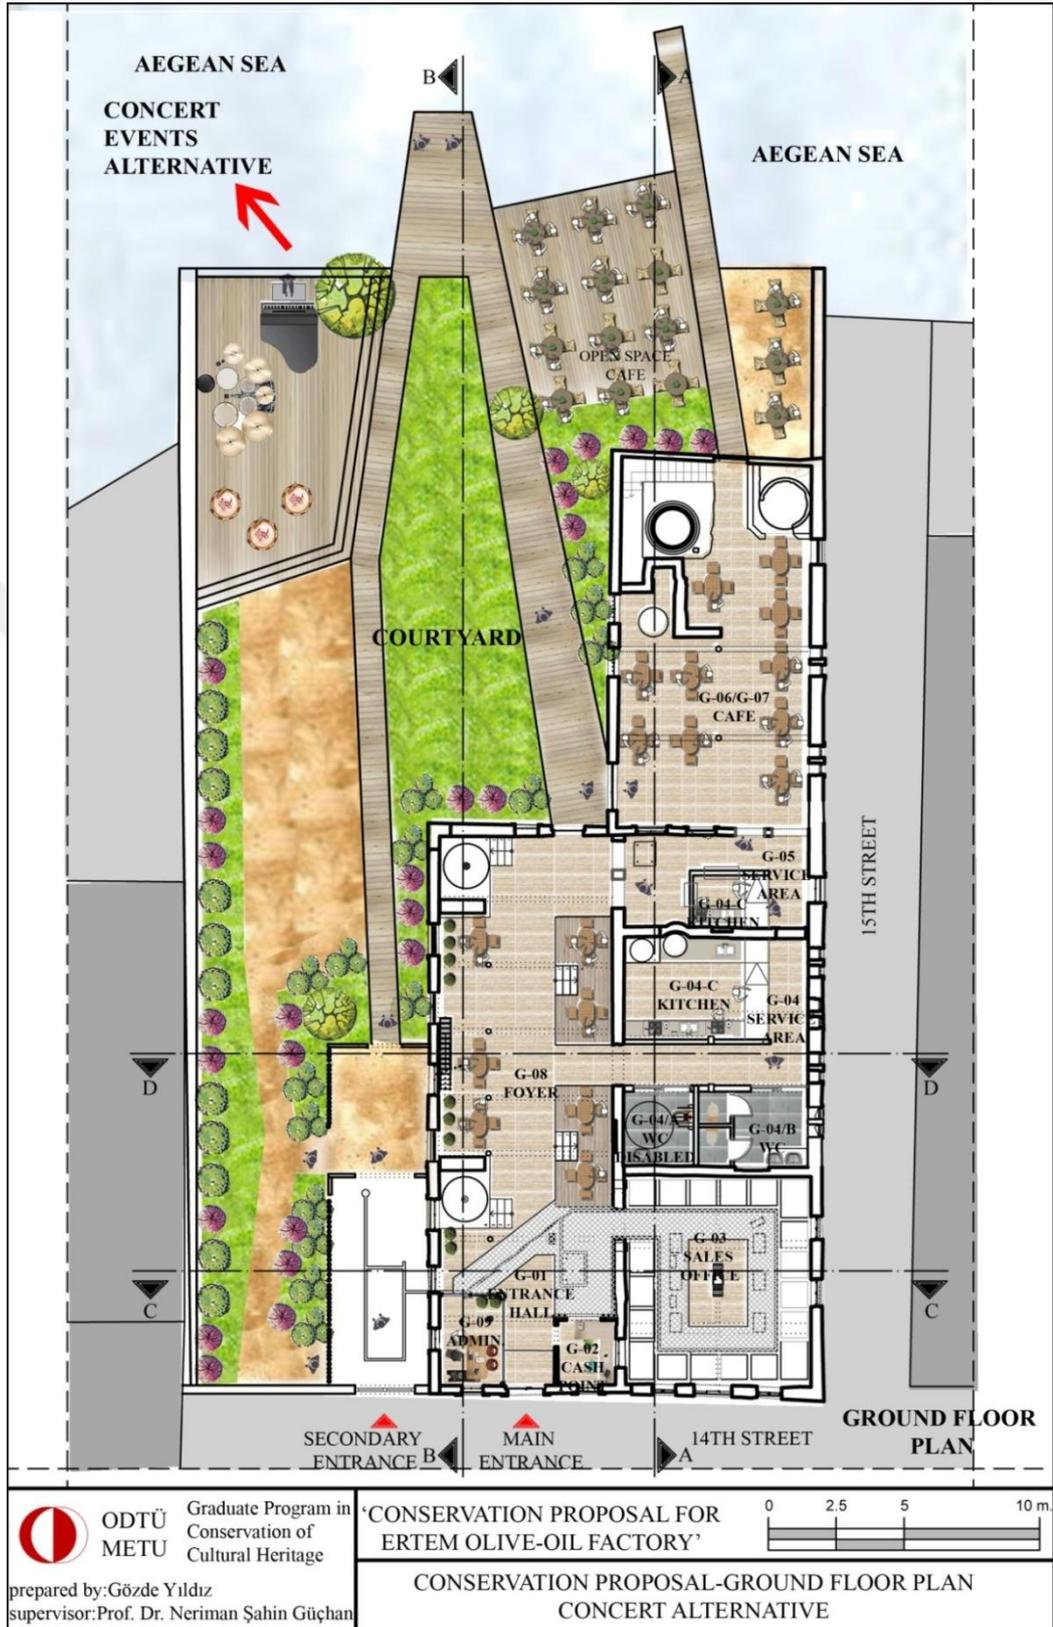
Conservation Proposal, ground floor plan, alternative-1 for the courtyard
